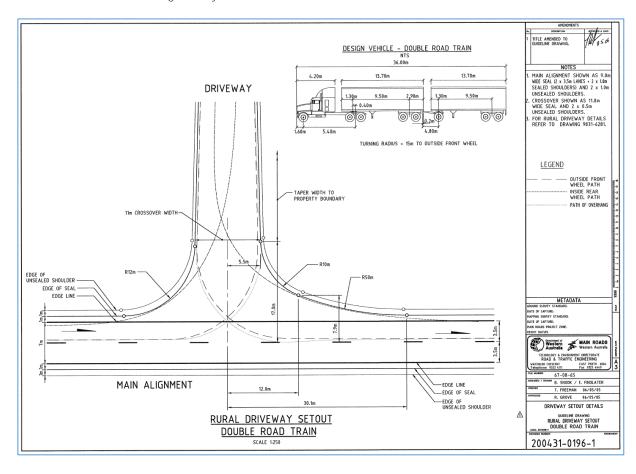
Example MRWA Rural Driveway Setout for Double Road Train Access
